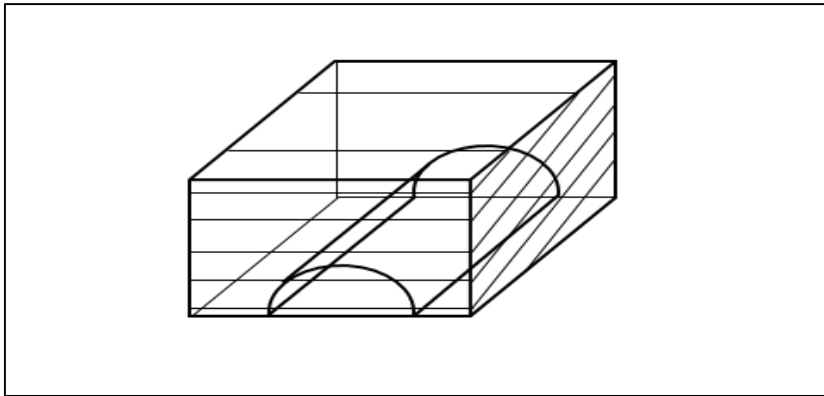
Joint strike parallel to tunnel. Dip 30°; Stress failure at 3.75×10^6 N/m²
